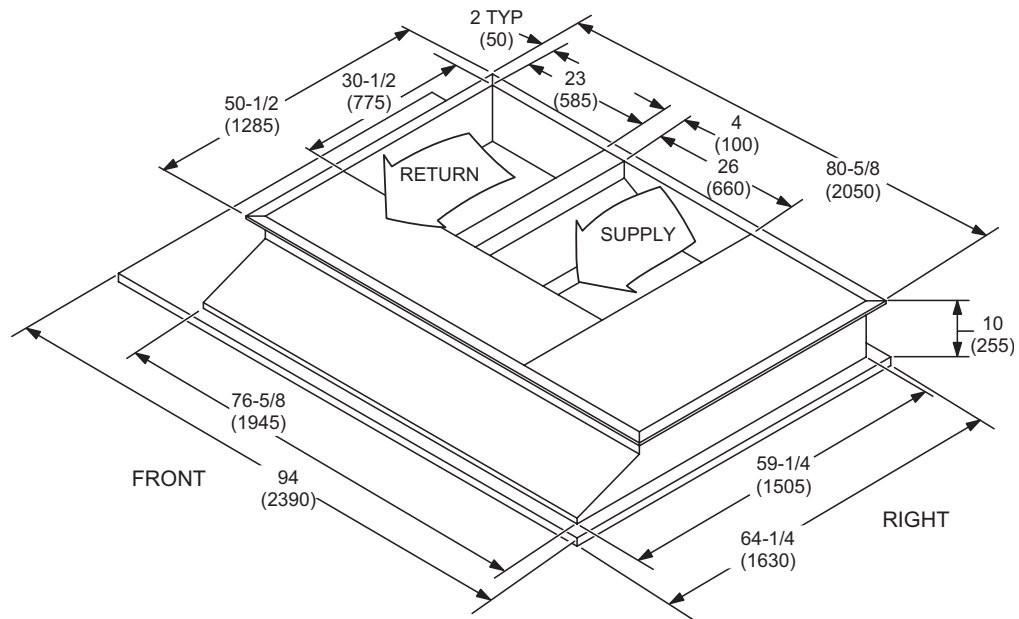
SUNLINE™ TO PREDATOR® TRANSITION ROOF CURB
